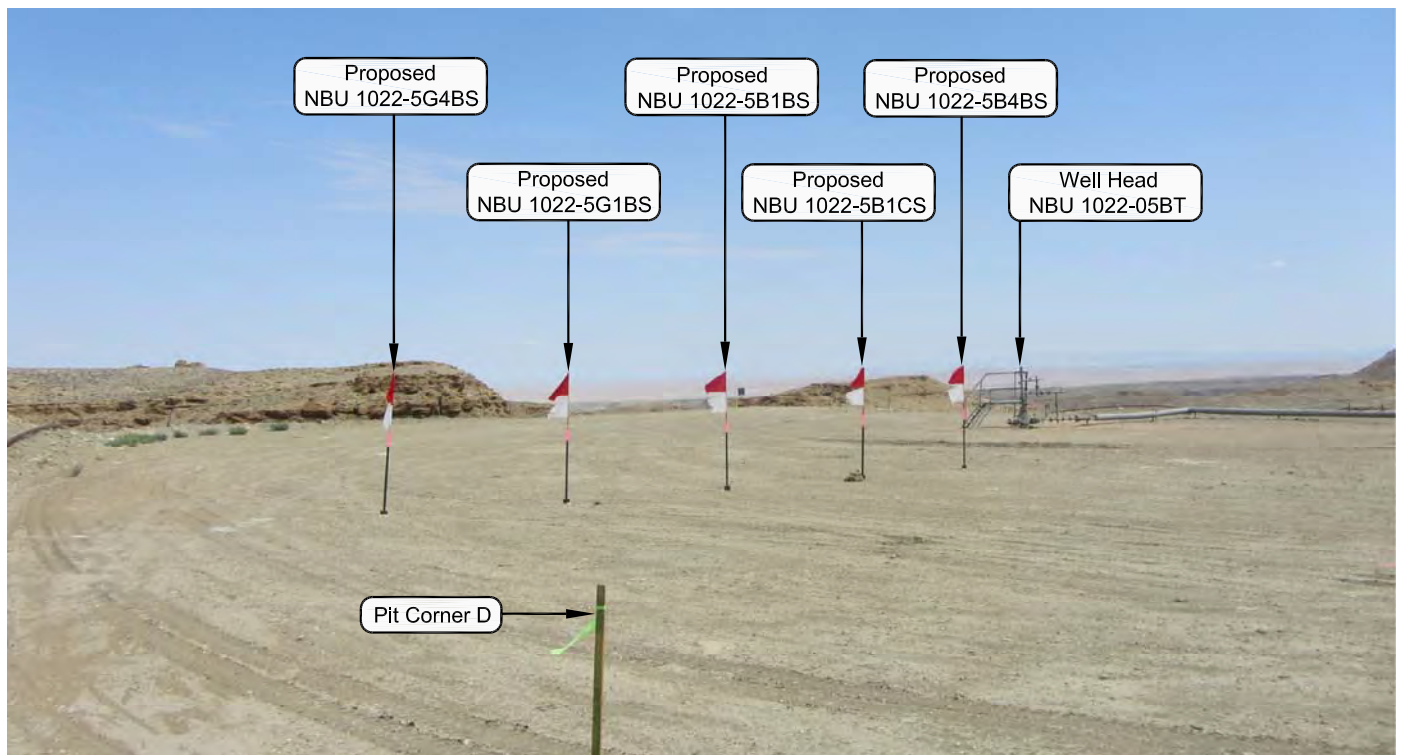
PHOTO VIEW: FROM PIT CORNER D TO LOCATION STAKE
